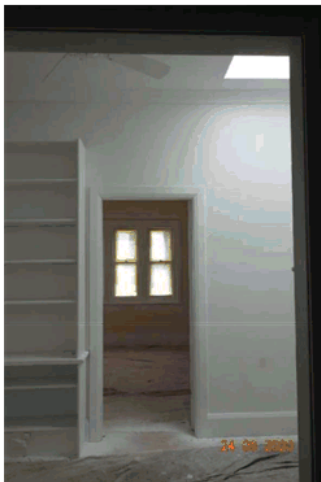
Typical view of a modified internal room with skylight, ceiling fan and joinery, looking north.
